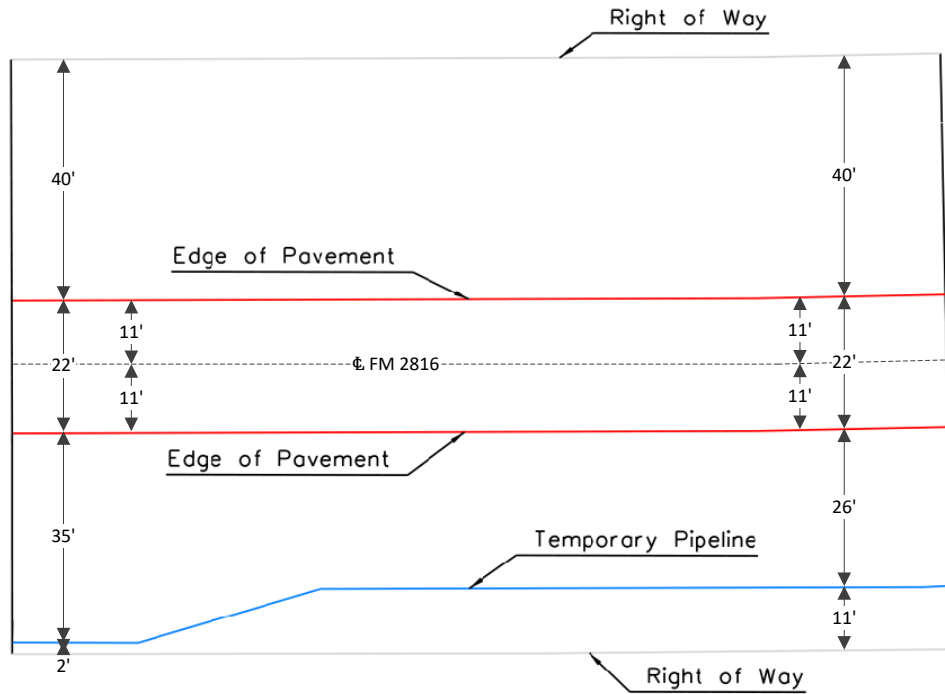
Plan View of Temporary Pipeline Installed on FM 2816 in De Witt County.
